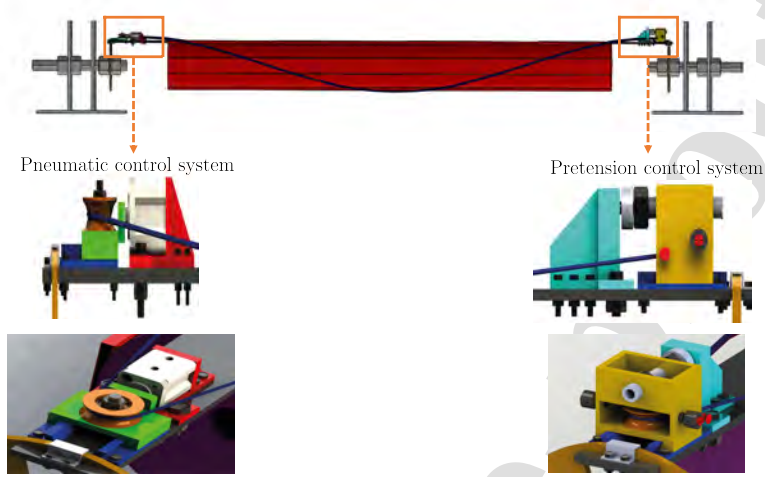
Layout of the tensairity prototype. The top picture shows the inflatable element, rope, strut, control mechanisms and supports. Details of pneumatic and pretensioning control systems are given in the close-ups on the bottom.
